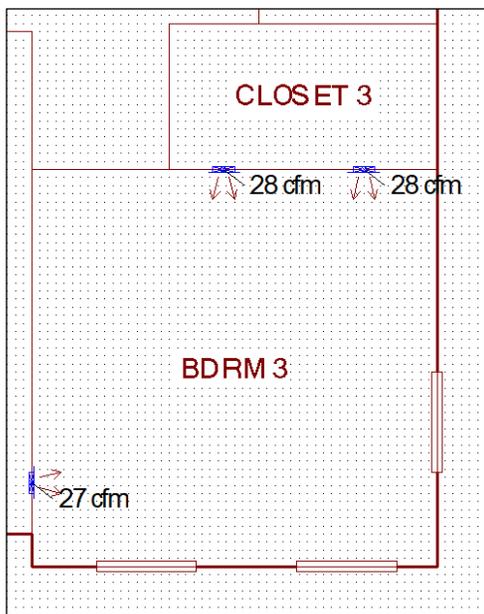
Example of High Sidewall Boots spaced out to reach all areas of the room.
